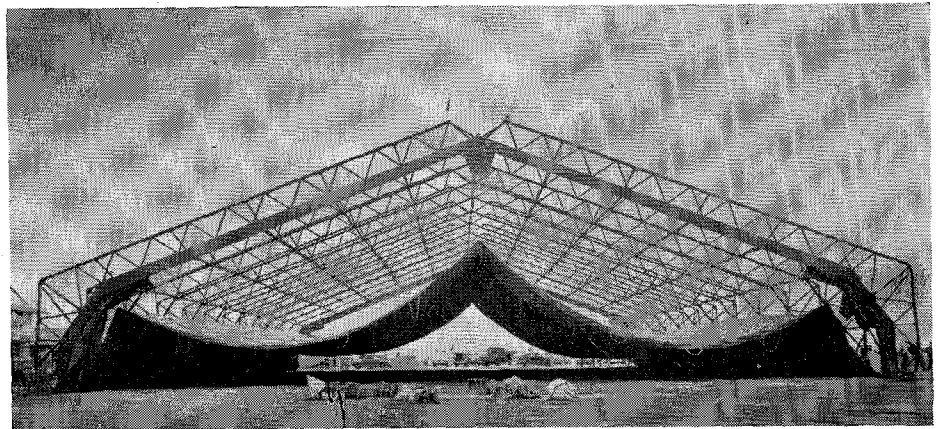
After the flame-proof canvas roof has been assembled on the floor of the hangar, it is raised to position as one unit. Ropes fastened to the canvas pass over the pulley on the truss along the bottom chords and over the sheaves to workmen on the ground.
